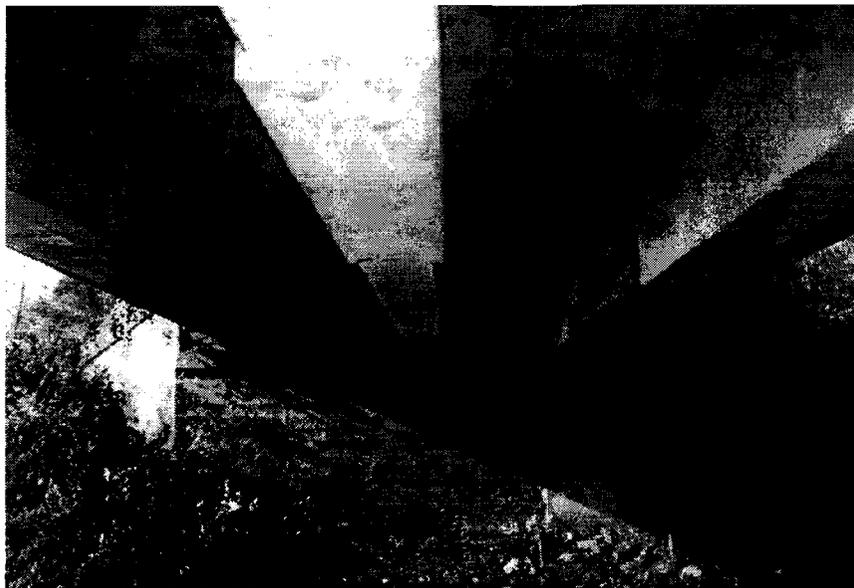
Deck-girder bridge: Structure # 6074, Bedford County (ca. 1920), showing details of girders on the underside of the bridge; one girder shows a later repair.
